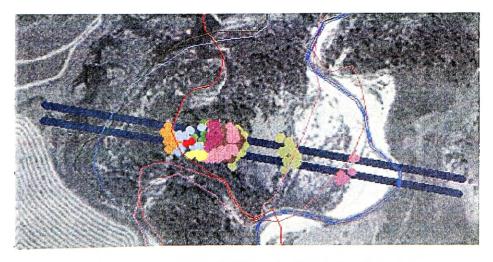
Plan view of Swath 3 superimposed over aerial photograph.
